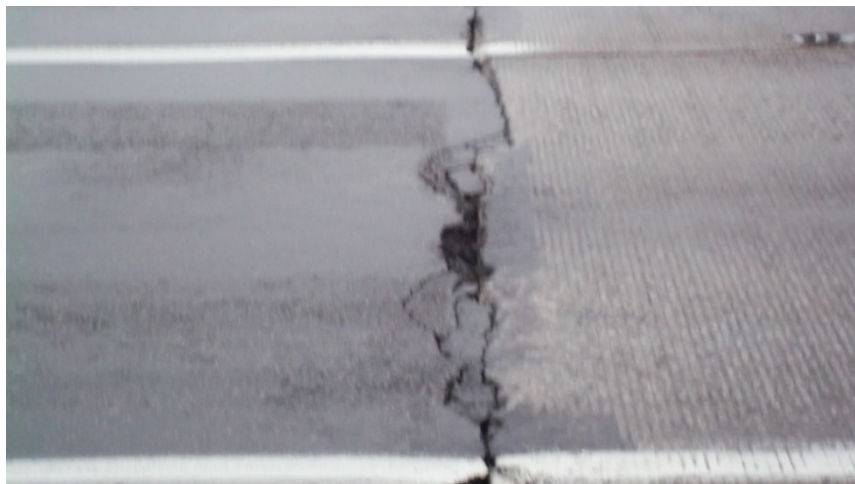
Asphalt to PCC Pavement Transition – LTPP Lane
